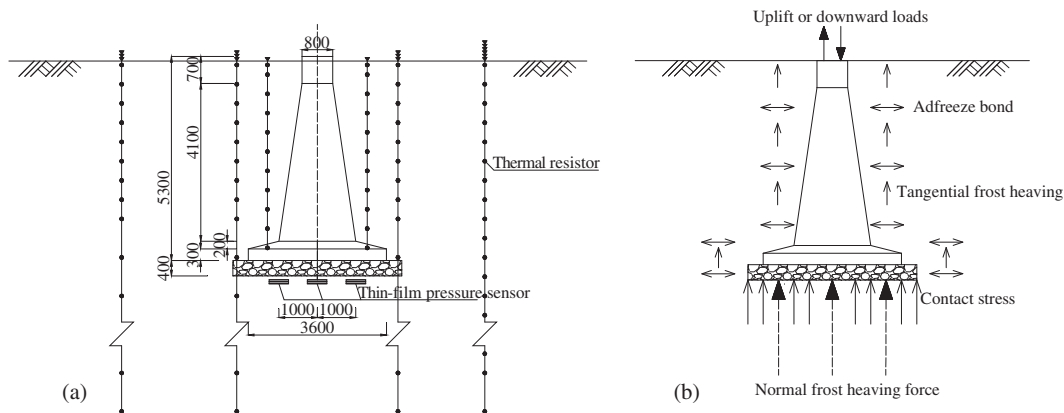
Sensor installation design at the test tower foundation (a) and force analysis (b) (unit: mm).
